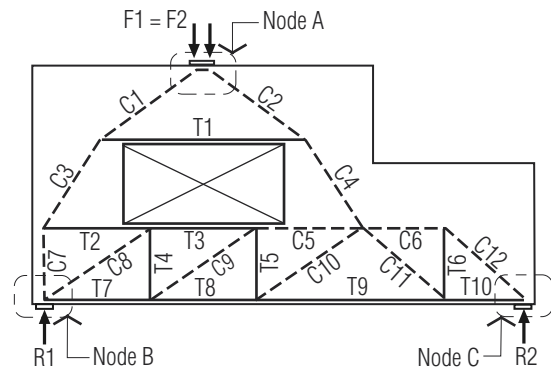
A truss model for a deep beam with an opening (Type I and III)
